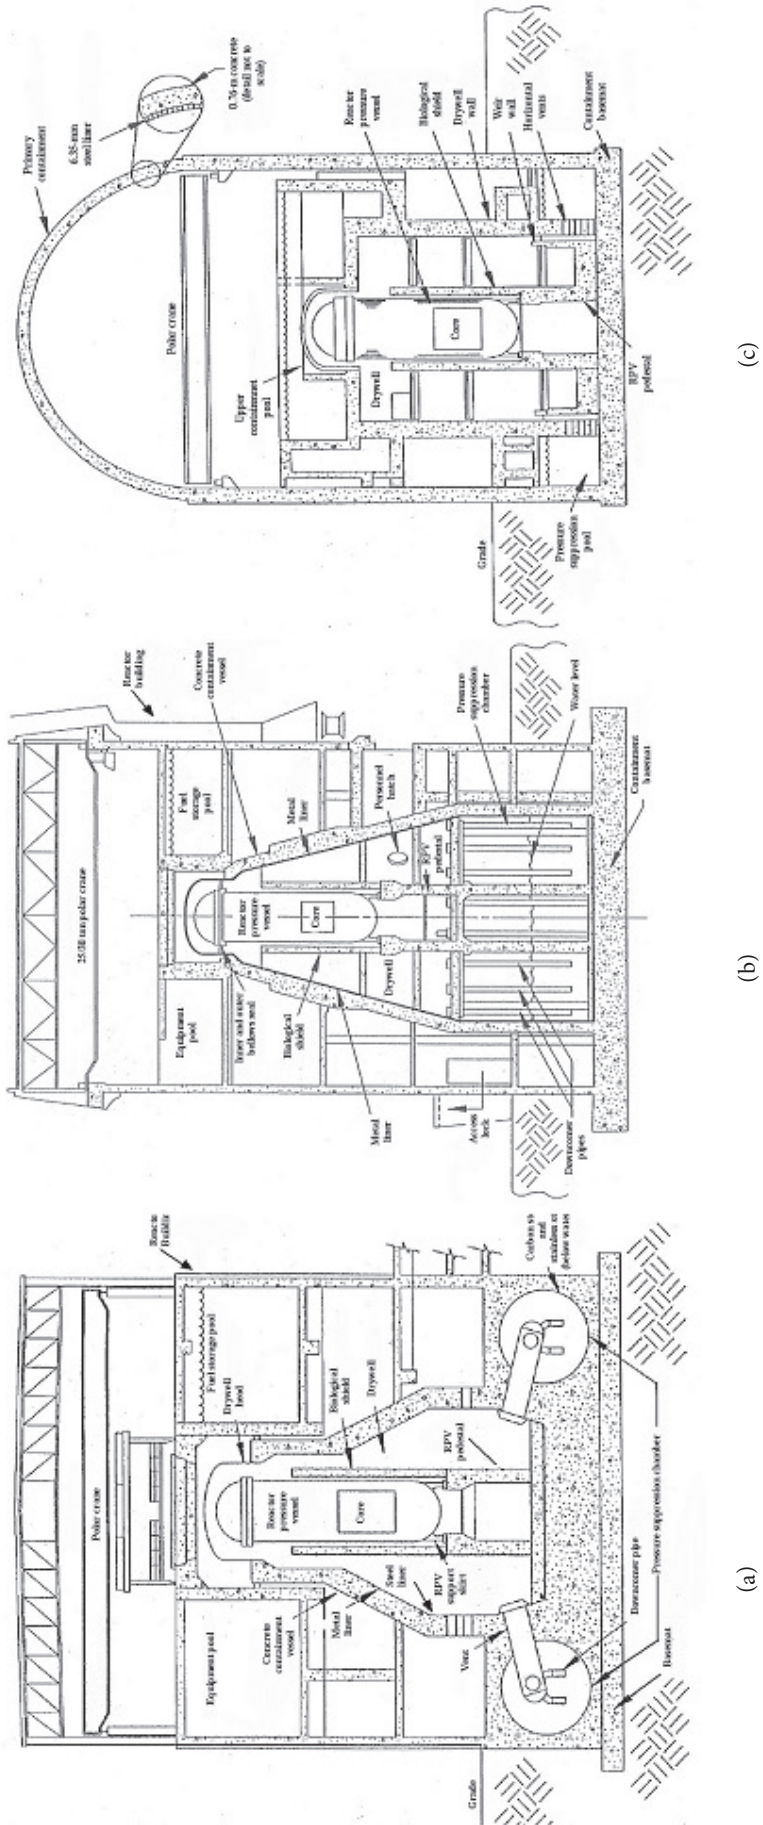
Typical GE BWR concrete containments: (a) Mark I; (b) Mark II; (c) Mark III [2].
